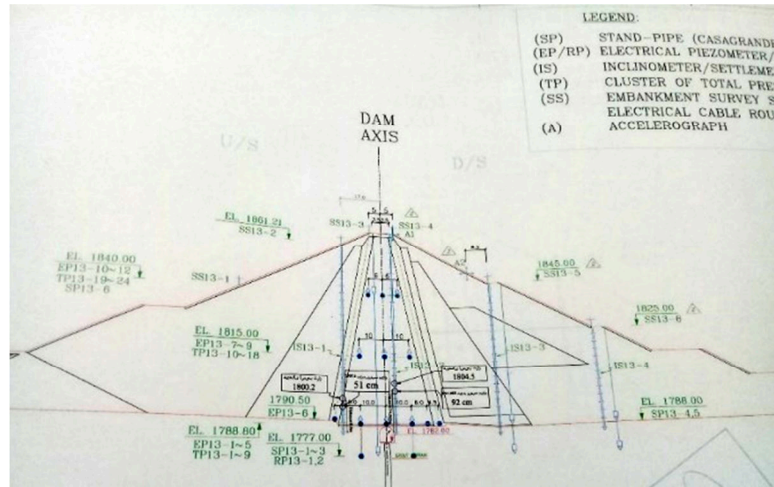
Typical cross-section of Kamal-Saleh earth dam (Lar Consulting Engineers Company, 2010)
